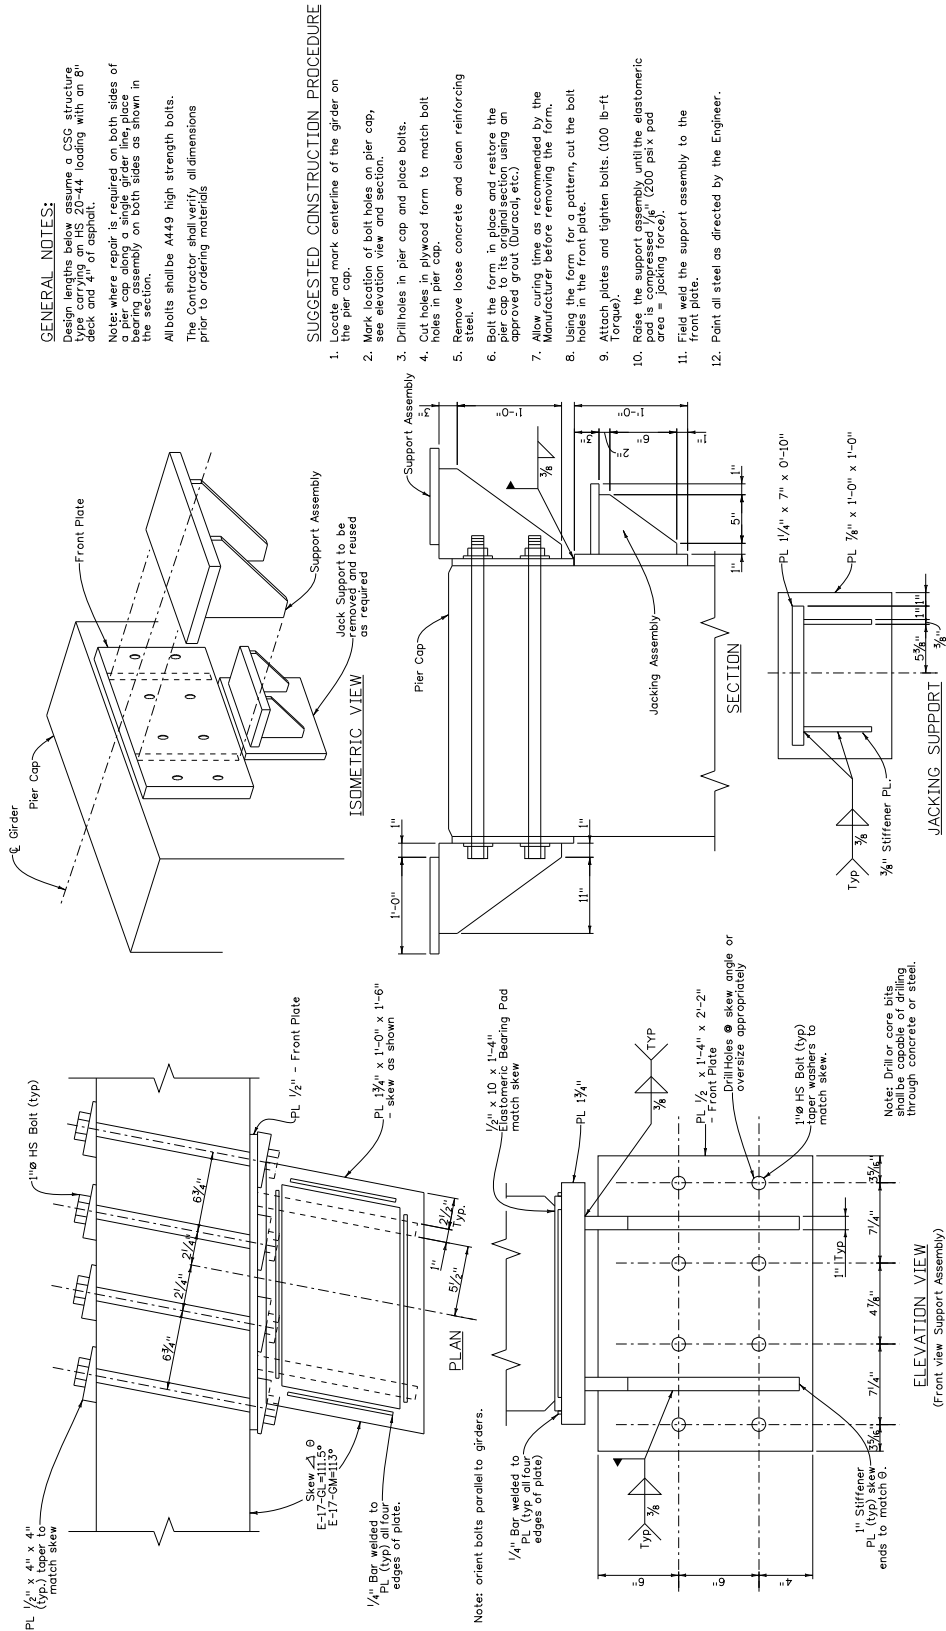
(F)-3 Sample Worksheet for Corbel Placement Details
